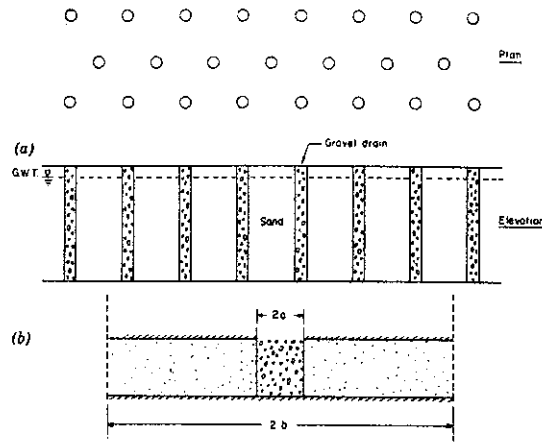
Gravel Drains for Stabilizing Liquefiable Soils: (a) Arrangement of Gravel Drain System; (b) Gravel Drain With Radial Drainage Only (Seed and Booker 1977)
